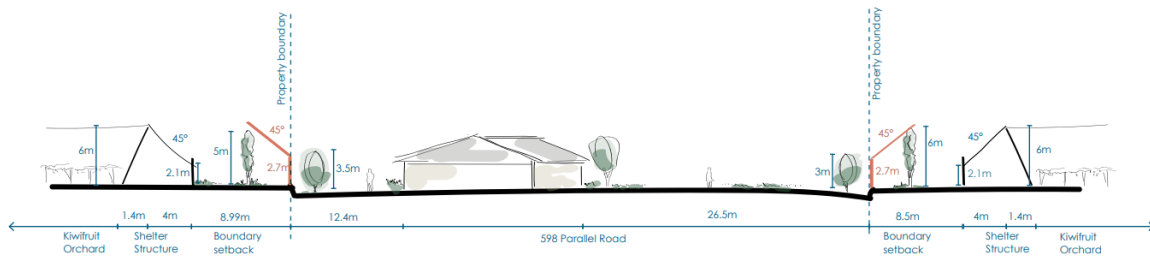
Western Elevation Plan with Shelter Belt Planting Shown
